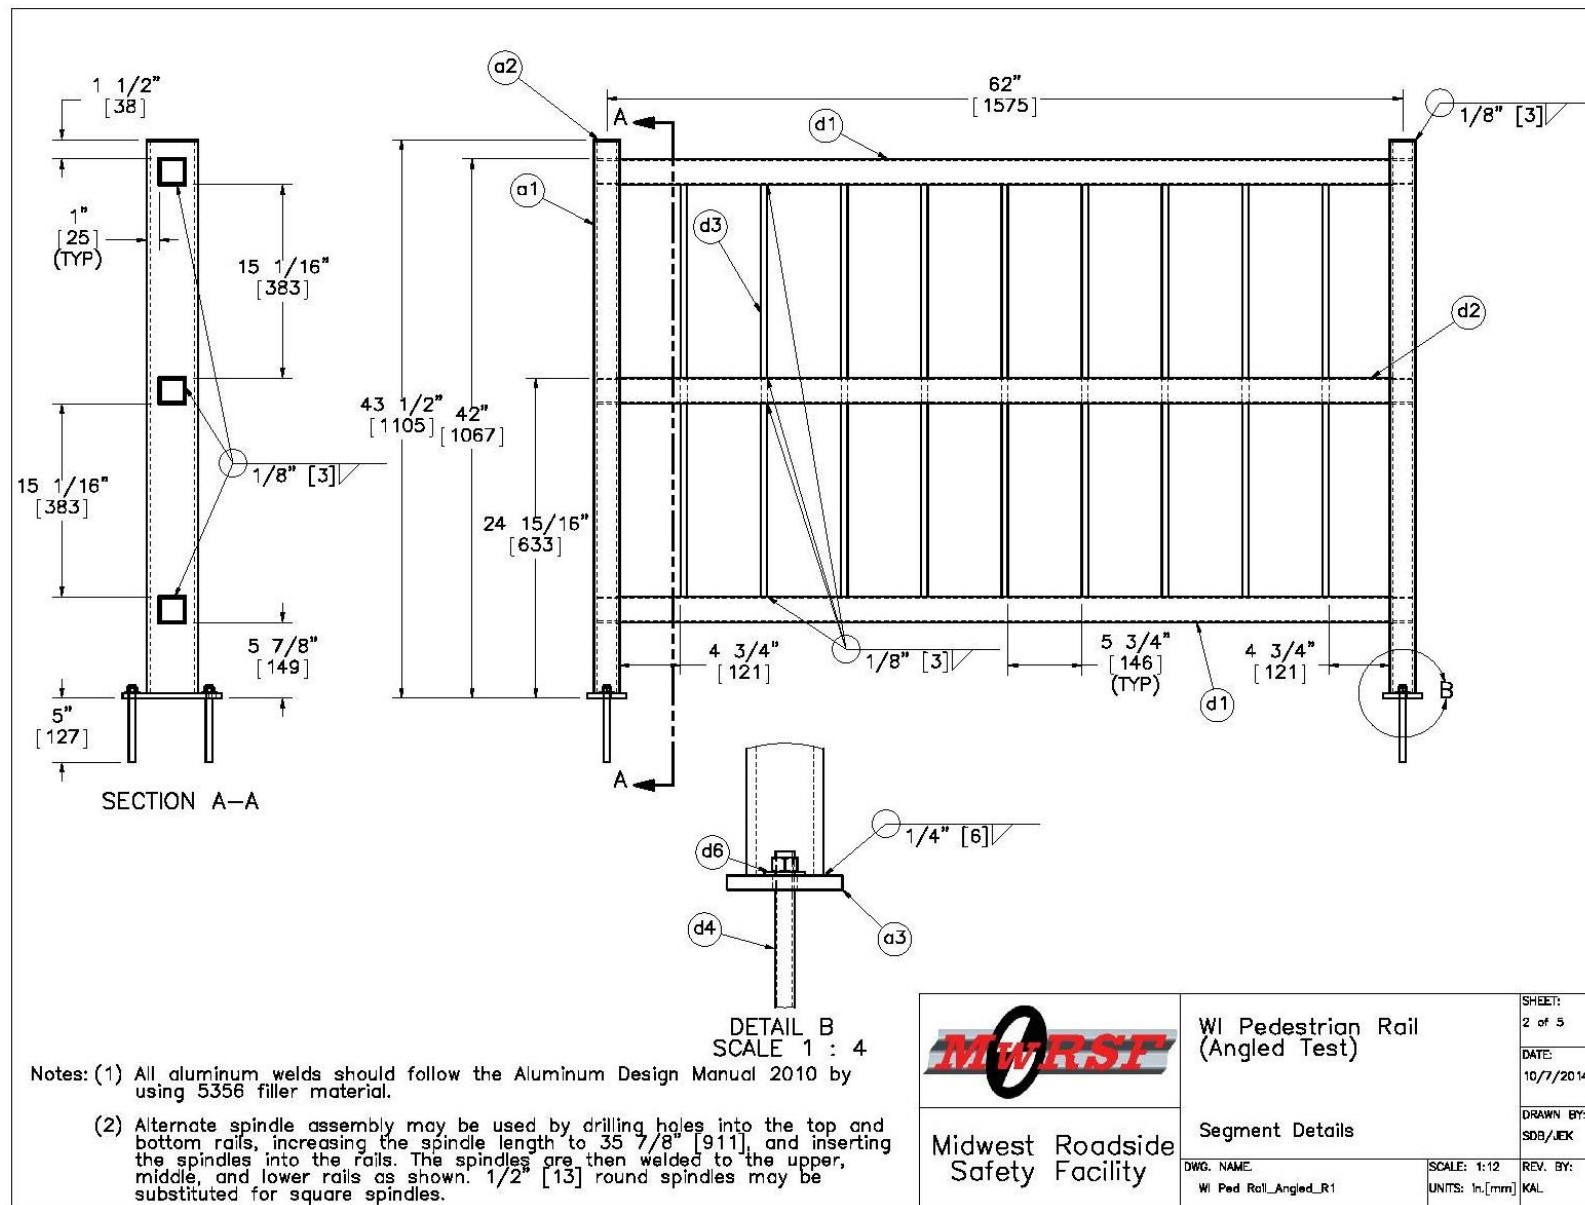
Pedestrian Rail Panel Details, Test Nos. APR-1 and APR-2
